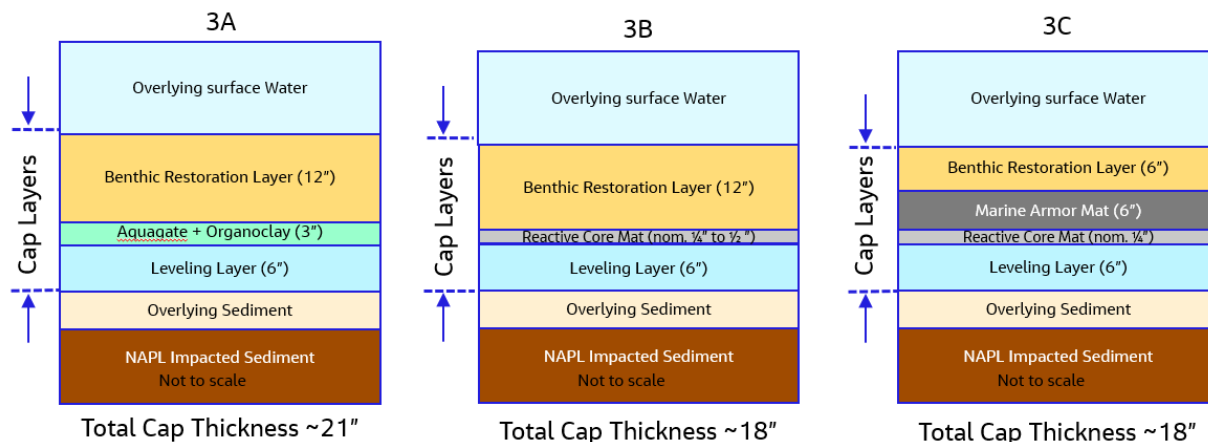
Typical Cross Section of Caps for Alternatives 3A, 3B, and 3C
